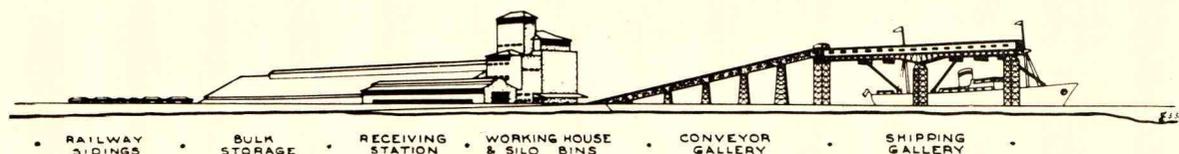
Sketch Layout of Bulk Handling and Storage Facilities Being Built for the State Wheat Board at Pinkenba.
